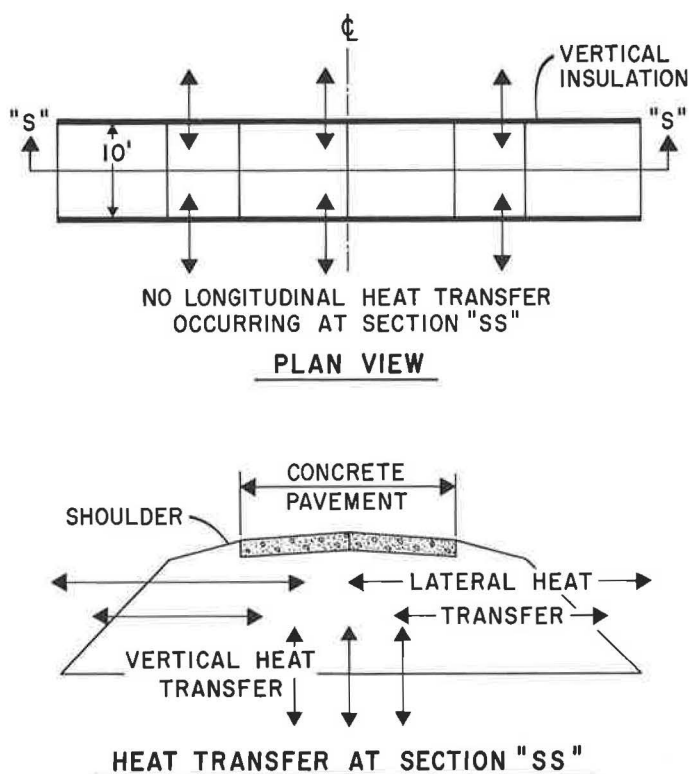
Thermal conditions found in a non-continuous test section using vertical insulation (test site just meeting minimum length requirements).
